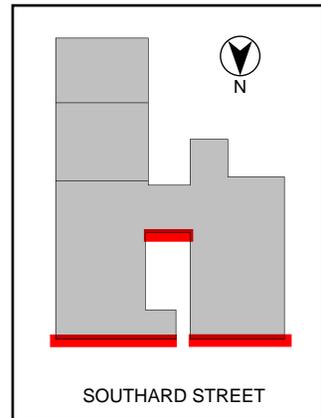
FRONT ELEVATION FROM SOUTHARD ST.
